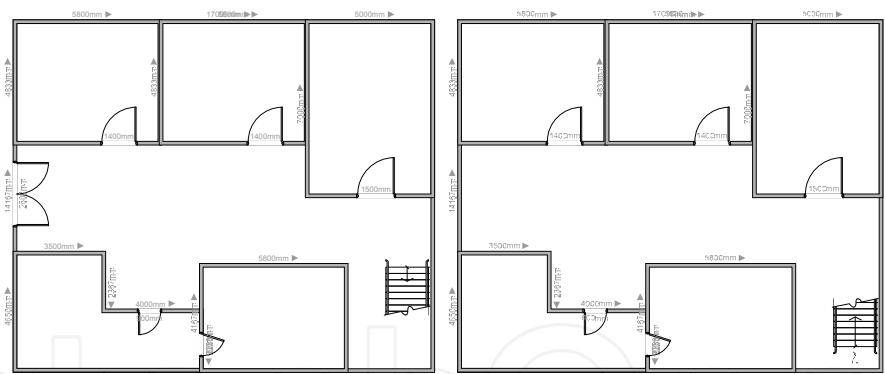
Factory plan, floor 1 (left) and floor 2 (right)
